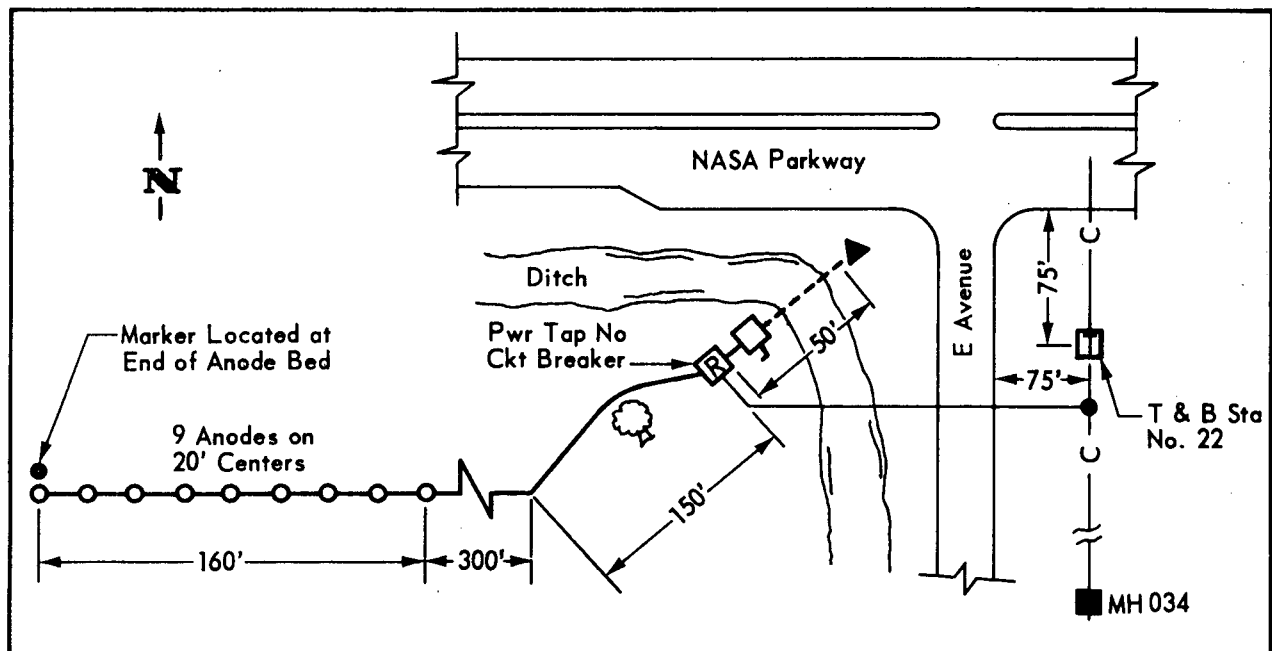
Site No. 24 and Test and Bond Station No. 22 Equipment Locator
